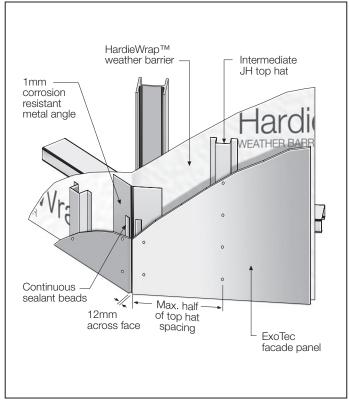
EXTERNAL CORNER CUTAWAY DETAIL
